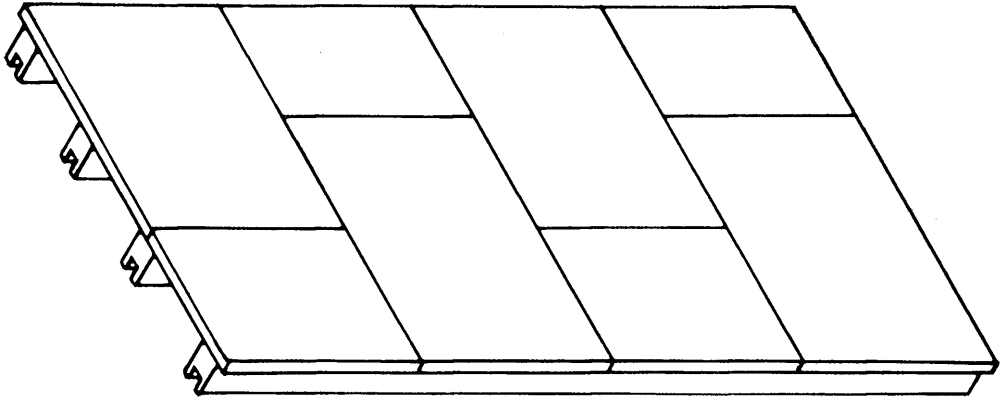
Typical wall construction showing horizontal and vertical joints in application of insulating board lath
